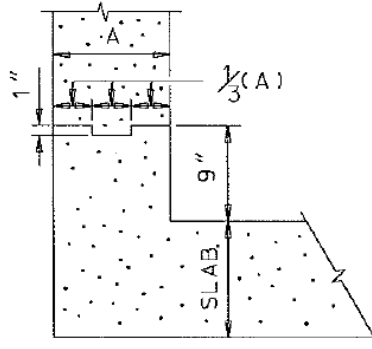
SCDOT Longitudinal Construction Joint Detail for Wall to Base Connections
